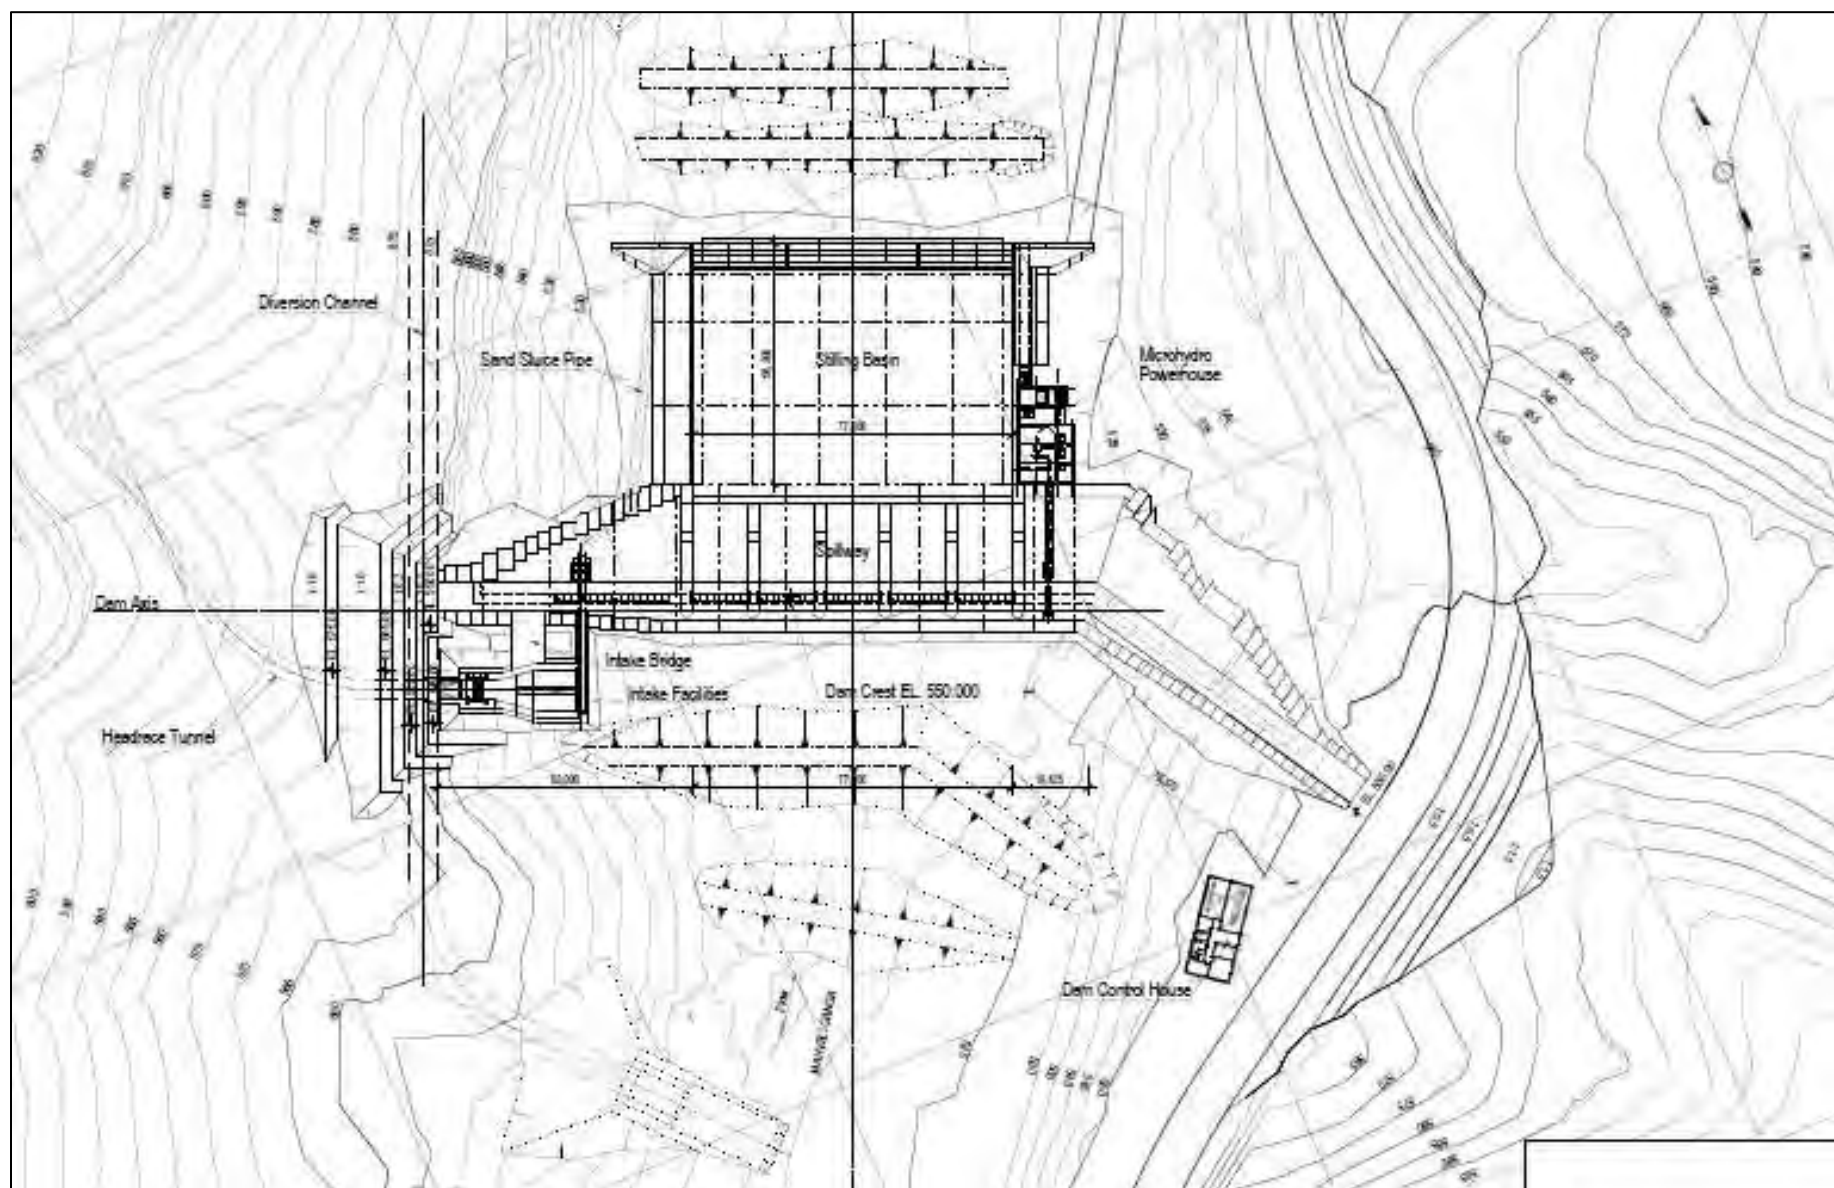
Plan view of the proposed dam, spillway, headrace tunnel intake and micro-hydro station
